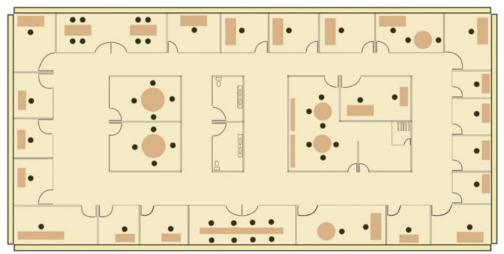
Typical Perimeter Cellular Office Layout – Image courtesy of The Office Space Planning Guide for Facilities Managers" by Taylor Short dated April 11, 2016
